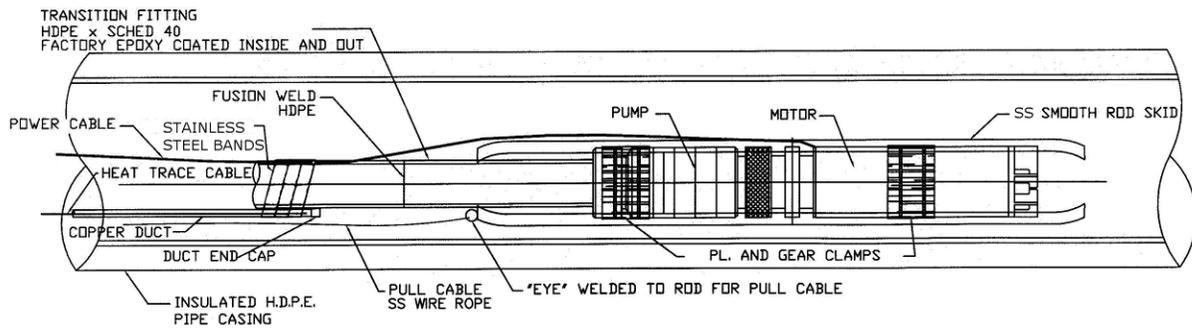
Typical Submersible Pump in a Casing Pipe
